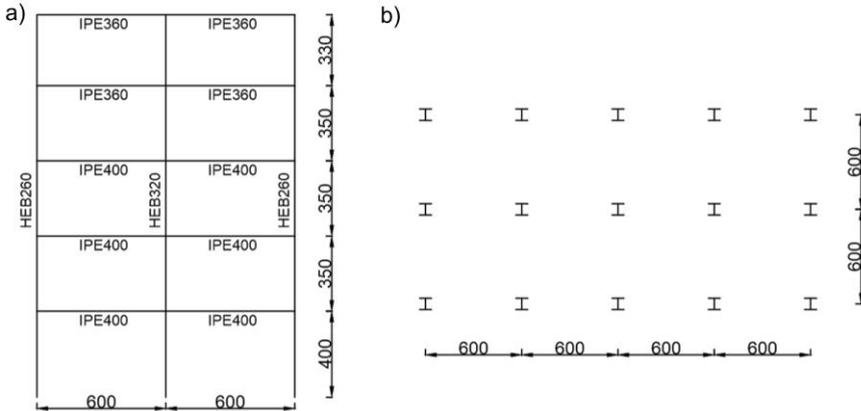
Main dimension of analysed building: a) main frame, b) plan.
